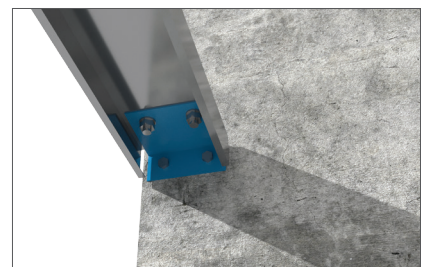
Detail of the stabilising member connection to the concrete column. The connecting angle piece is fixed to the concrete column by means of chemical anchors.
